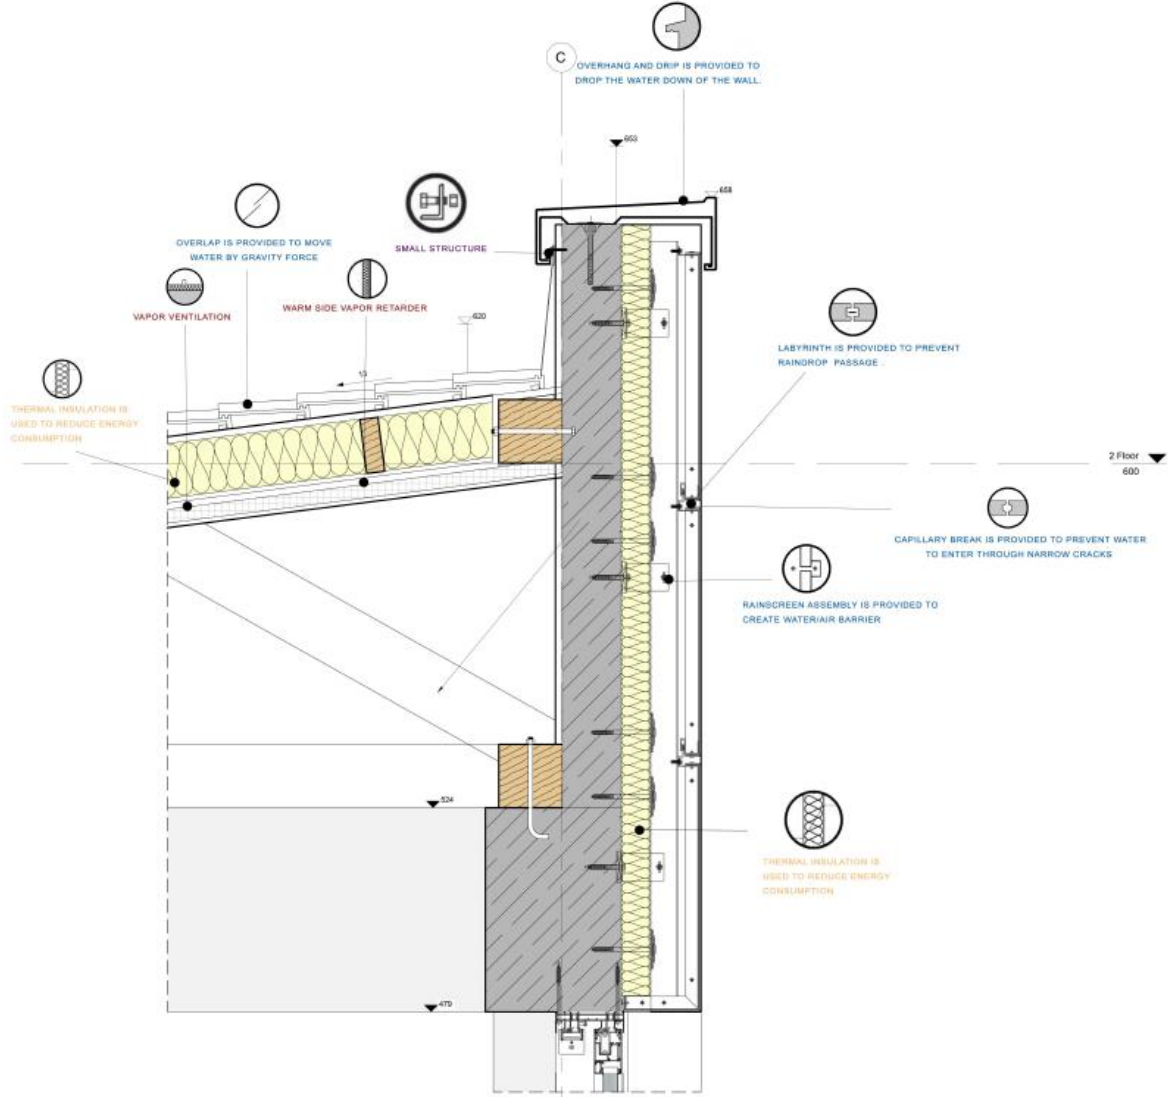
An example for detail design with detail patterns (Detail 3: Exterior wall - roof joint).
